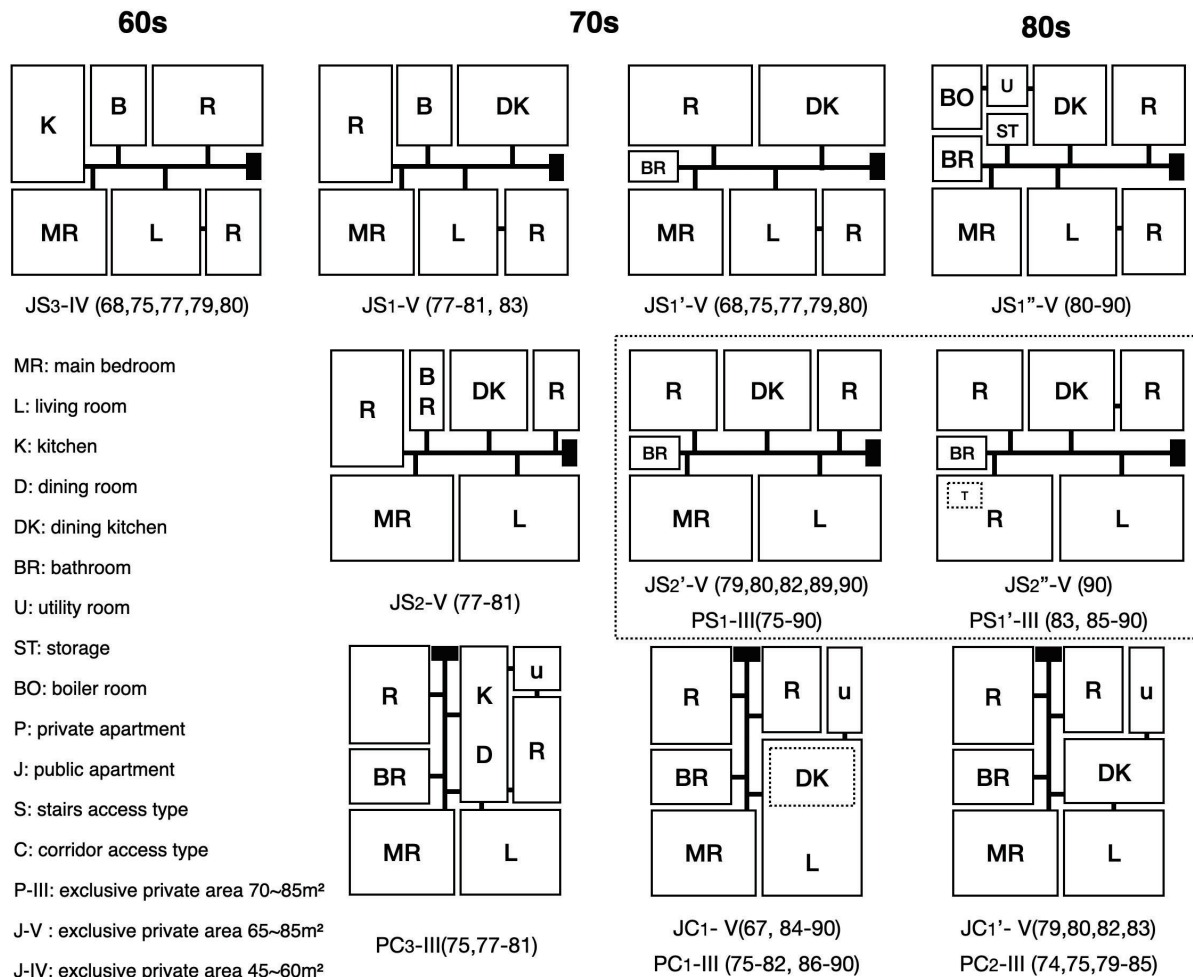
Typical 3 bedroom plan in Seoul and 5 new town
